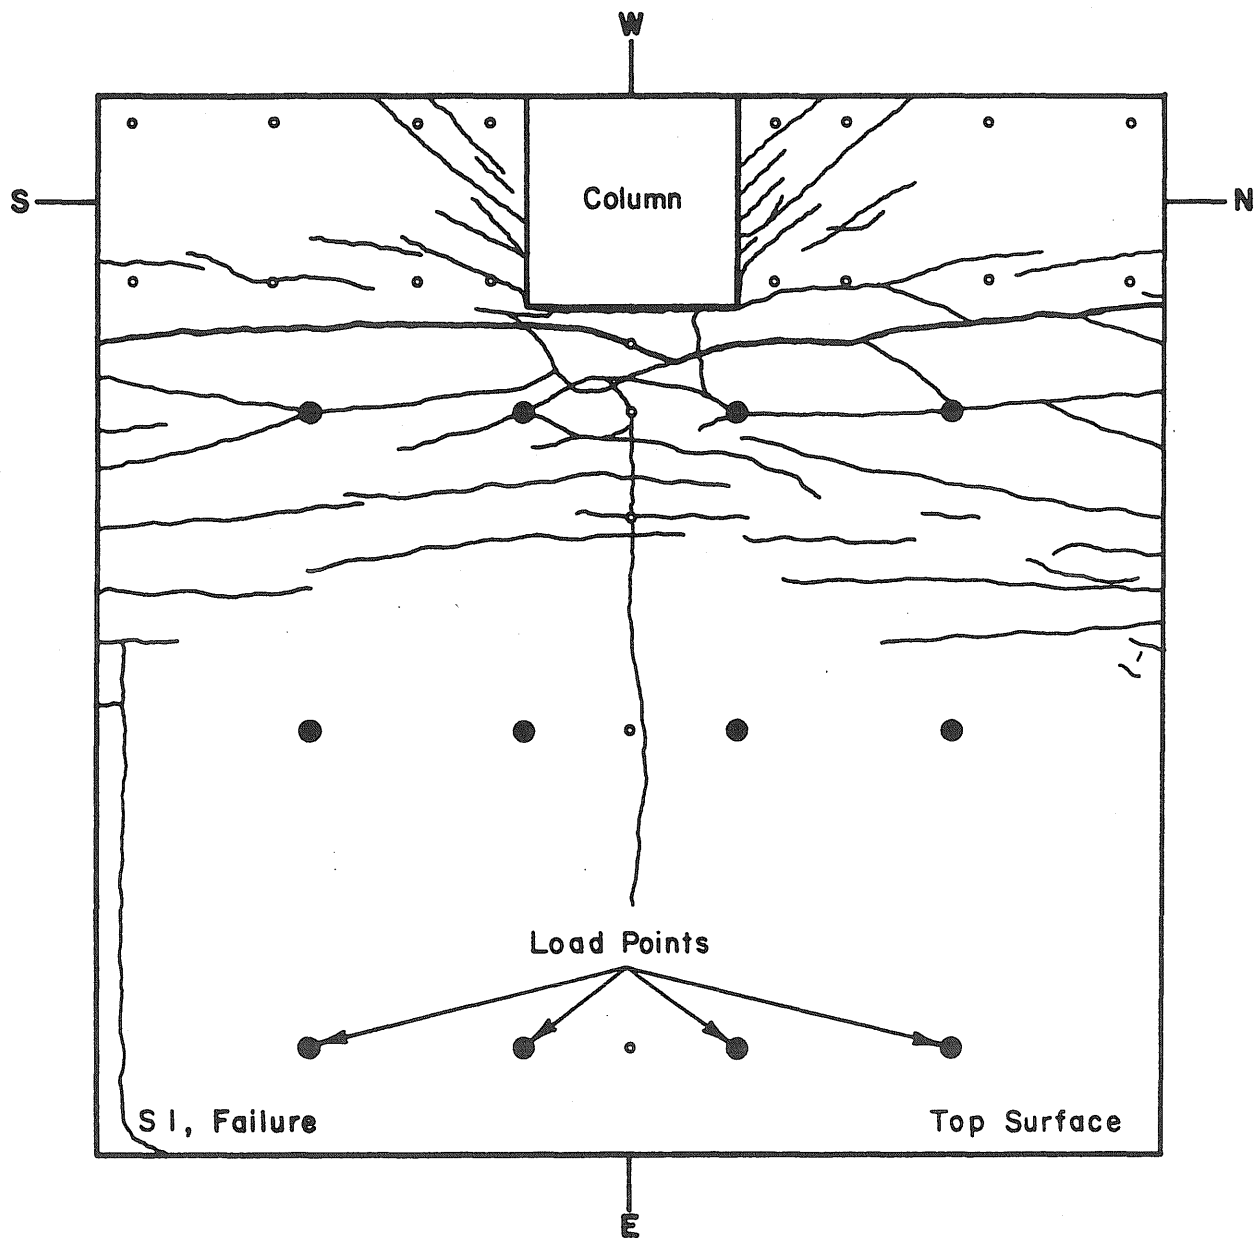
Crack Pattern at Failure on the Top Surface of Specimen S1
